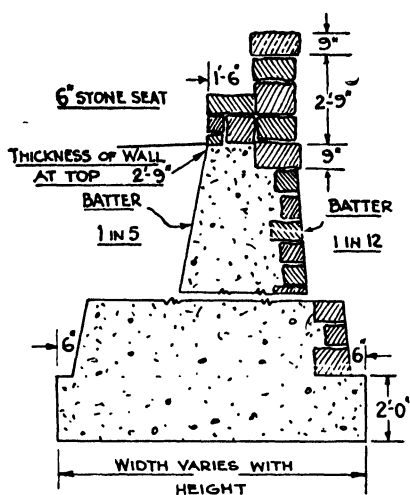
NANT BRIDGE: SECTION OF WING WALL.
